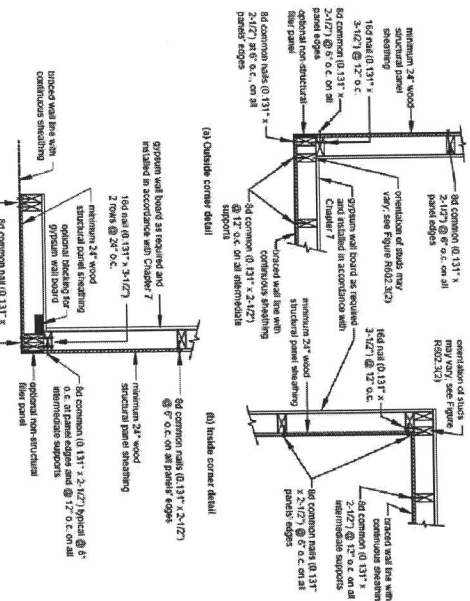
CORNER FRAMING REQUIREMENTS FOR CONTINUOUS SHEATHING
